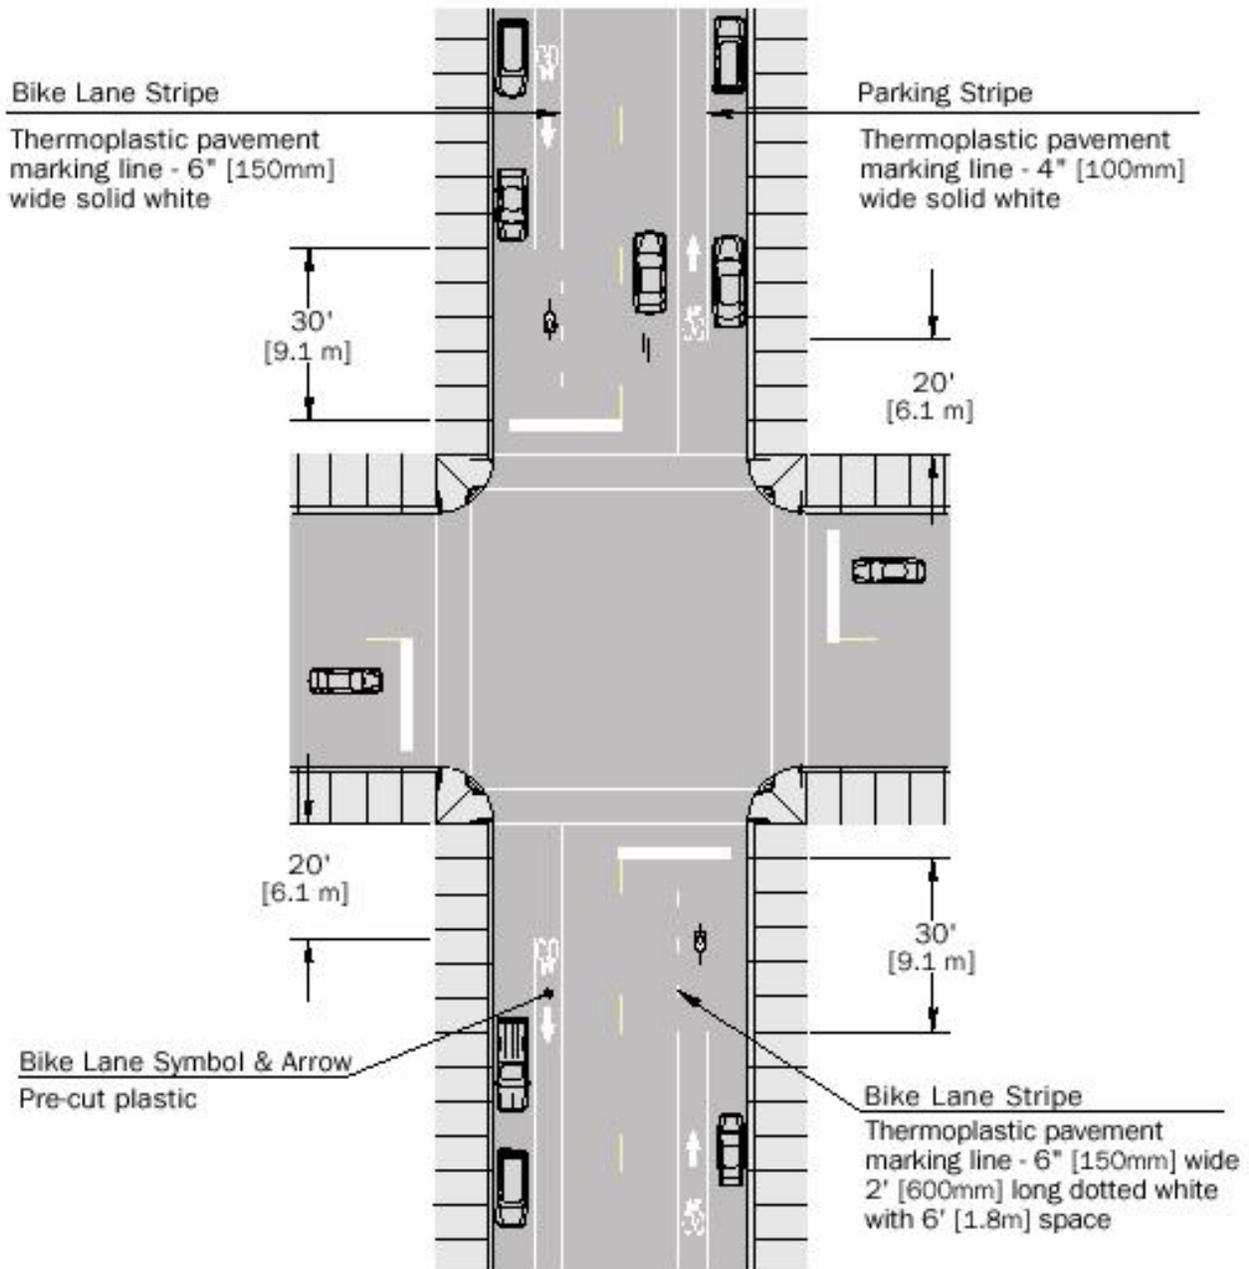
Striping for bike lane with parking at intersection with two-lane arterial
